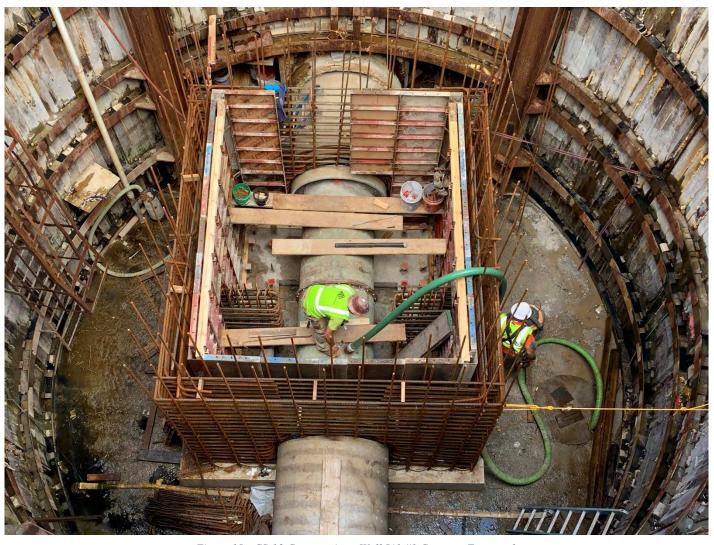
CS-13 Construction - Wall Lift #1 Concrete Formwork
